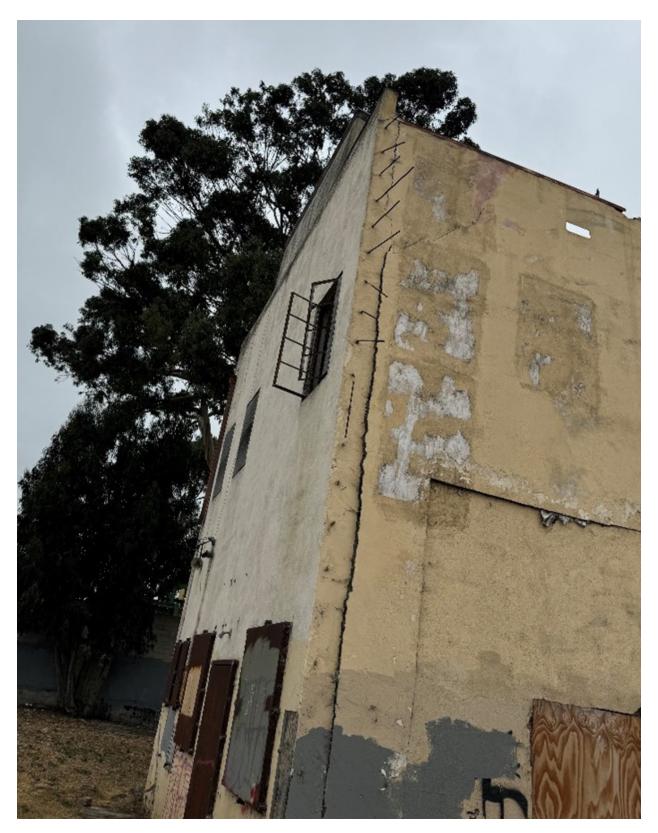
Photo of full height crack in stucco at southwest junction of concrete wall and wood framed wall, Howard Carter Associates, Inc, 2024.
